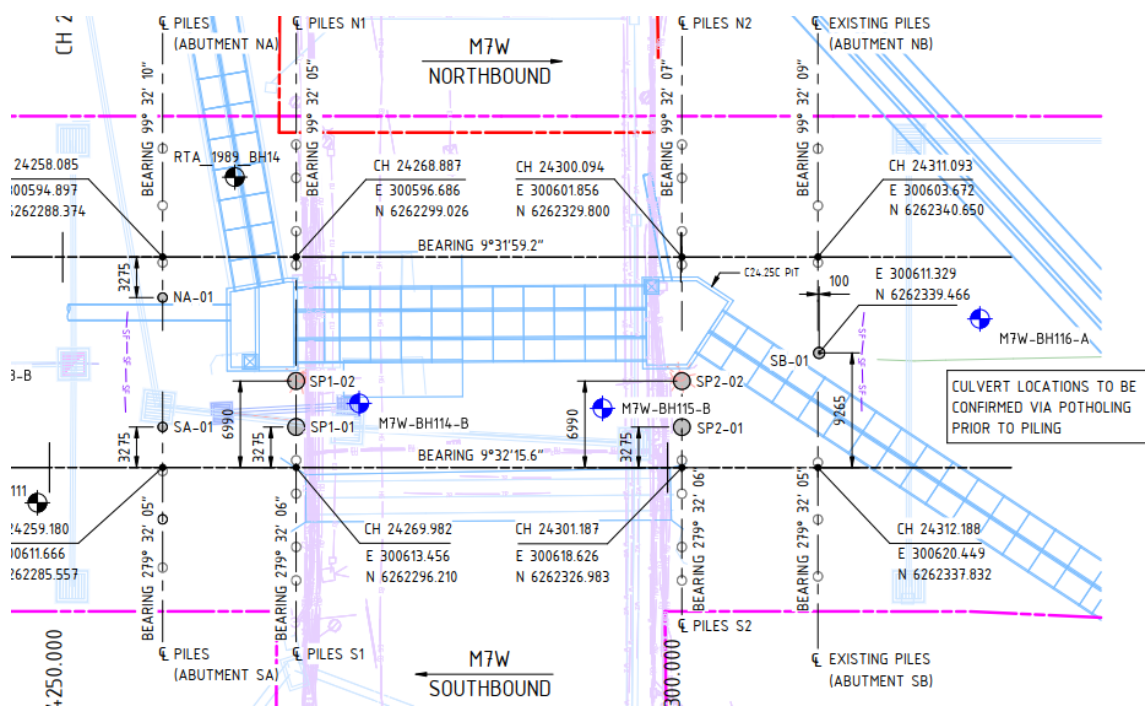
Site Constraint at Infra 32.1/32.2 – Existing Culvert
